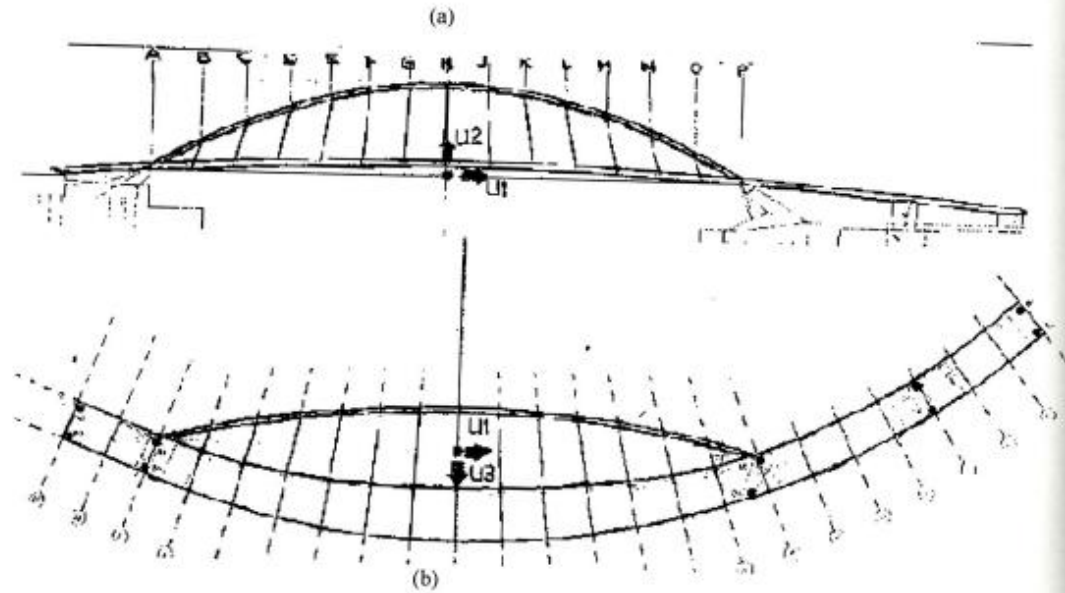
(a) Elevation and, (b) Plan view of the Merchants Bridge
